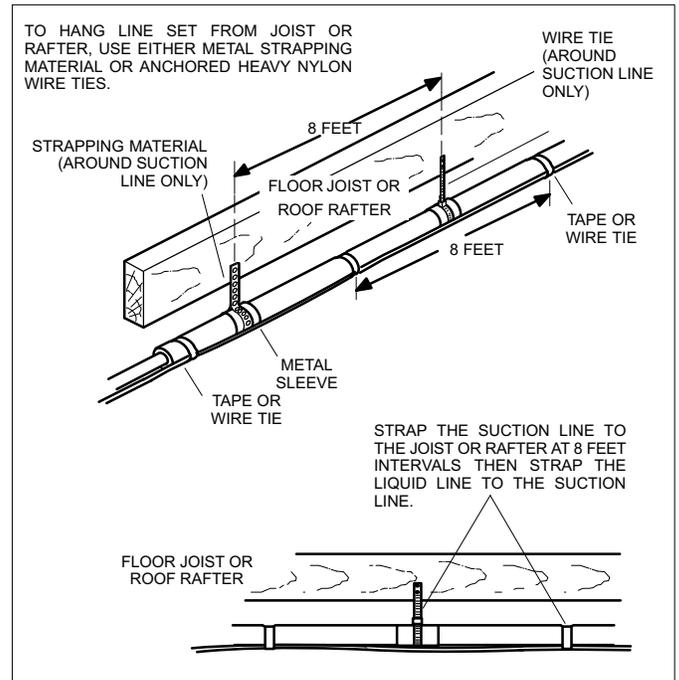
Refrigerant Line Set: Installing Horizontal Runs
